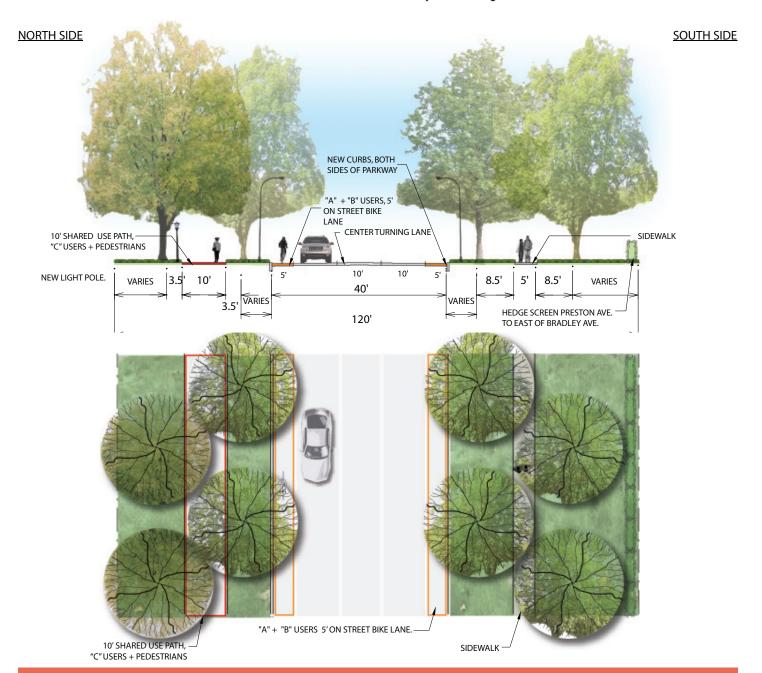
Eastern Parkway: Zone 4, 5 & 6 Prototypical Section & Plan
